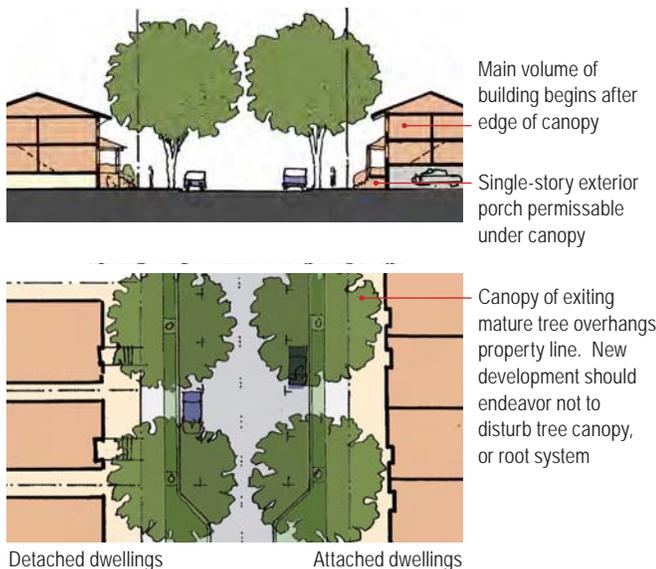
Prototypical street section and plan showing the relationship of street trees to property lines, parking and building volume.
